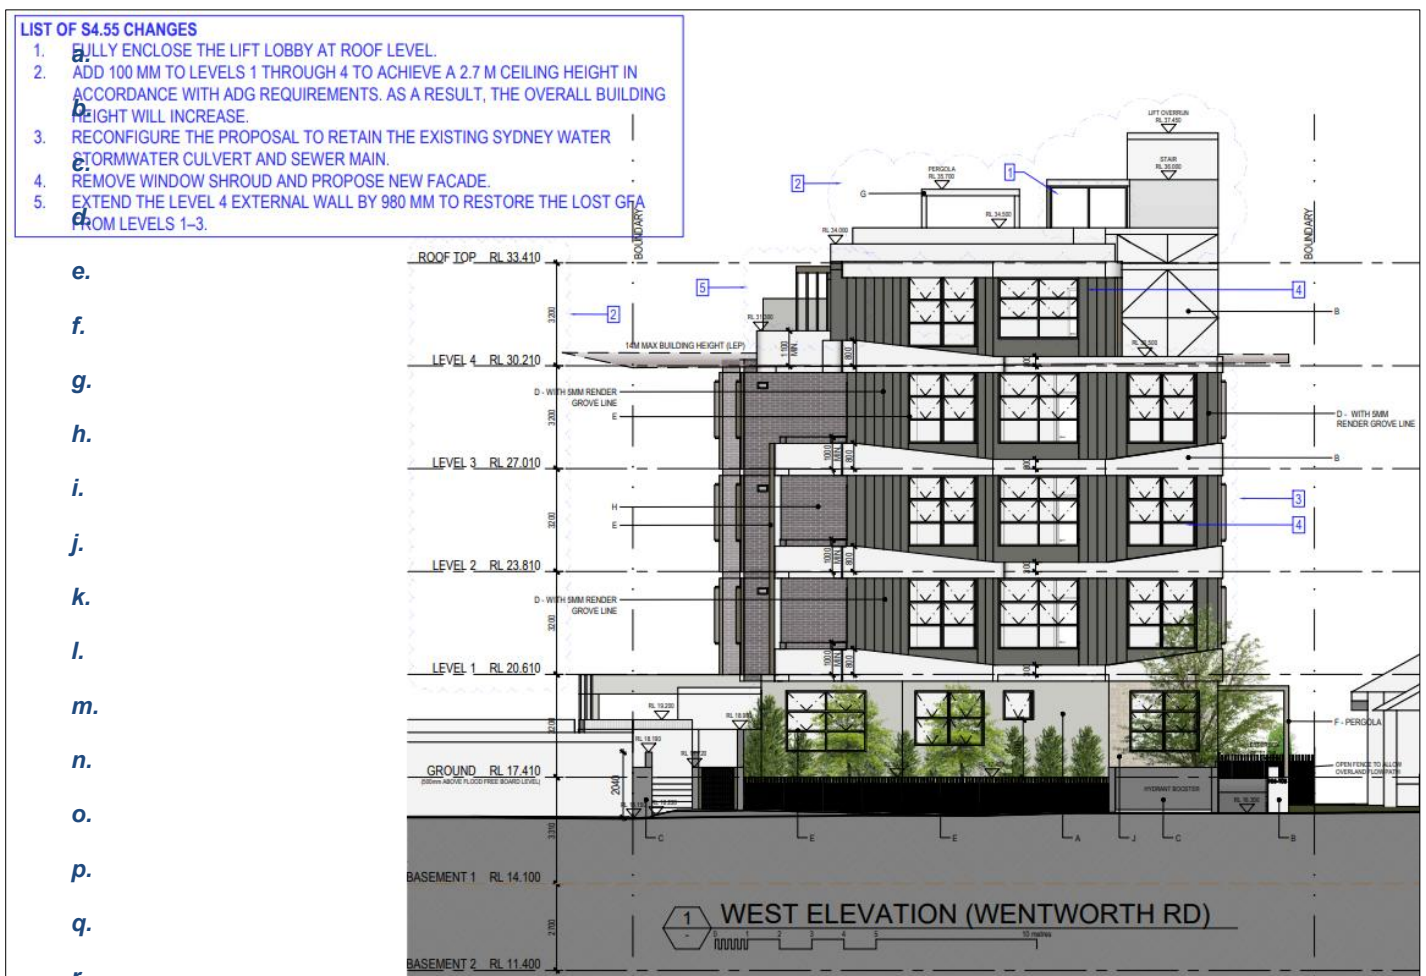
(above) Amended West (Front) Elevation plan submitted by the applicant. Source: Bechara Chan & Associates (March 2026)
